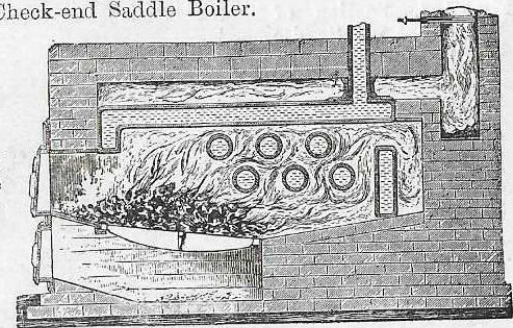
Section of Check-end Saddle Boiler Set in Brick-work.
